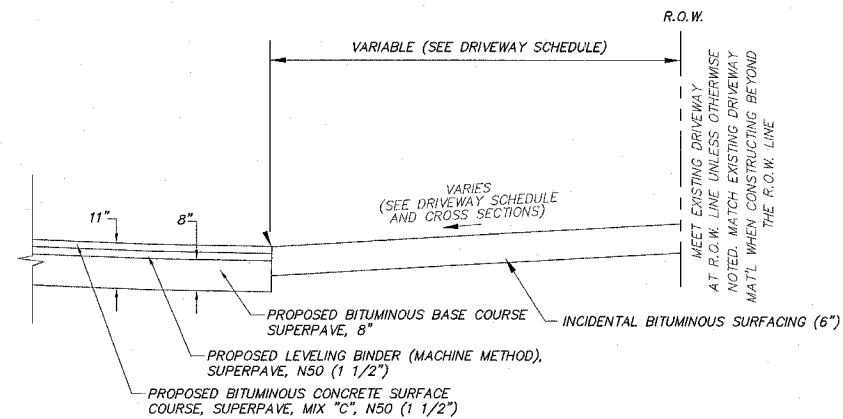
DETAIL-PRIVATE AND COMMERCIAL DRIVEWAY ENTRANCE
